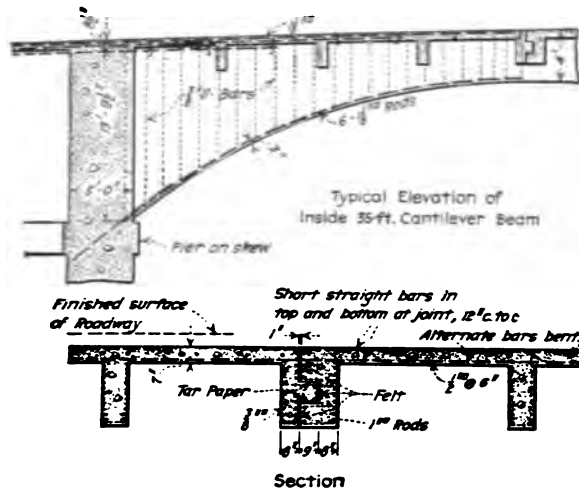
Details of Hopple Street viaduct, Cincinnati, Ohio.
